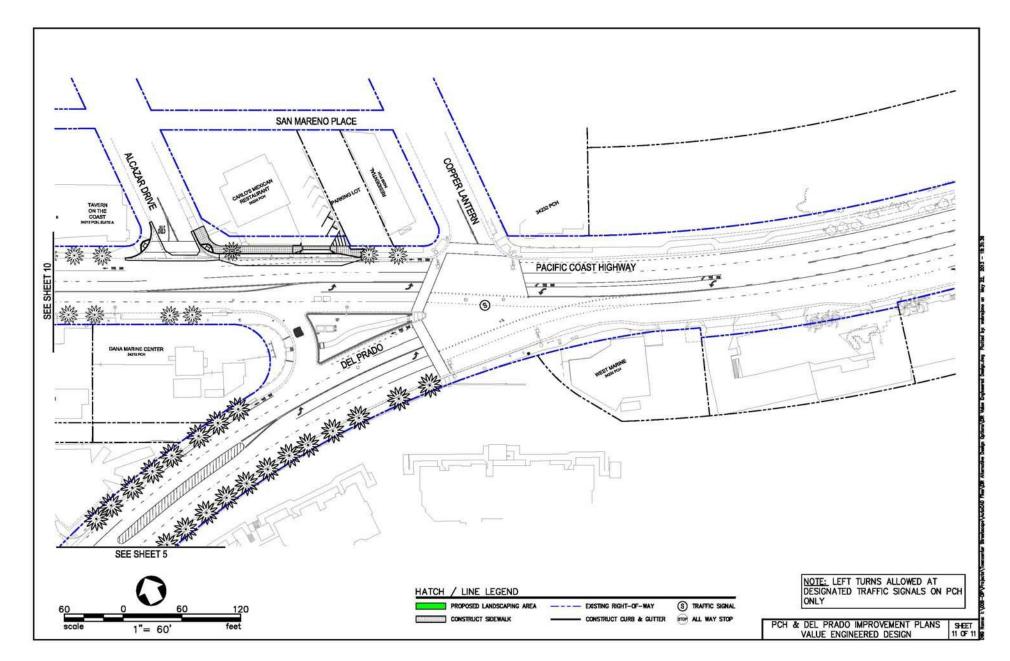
Pacific Coast Highway - East to Del Prado Avenue
